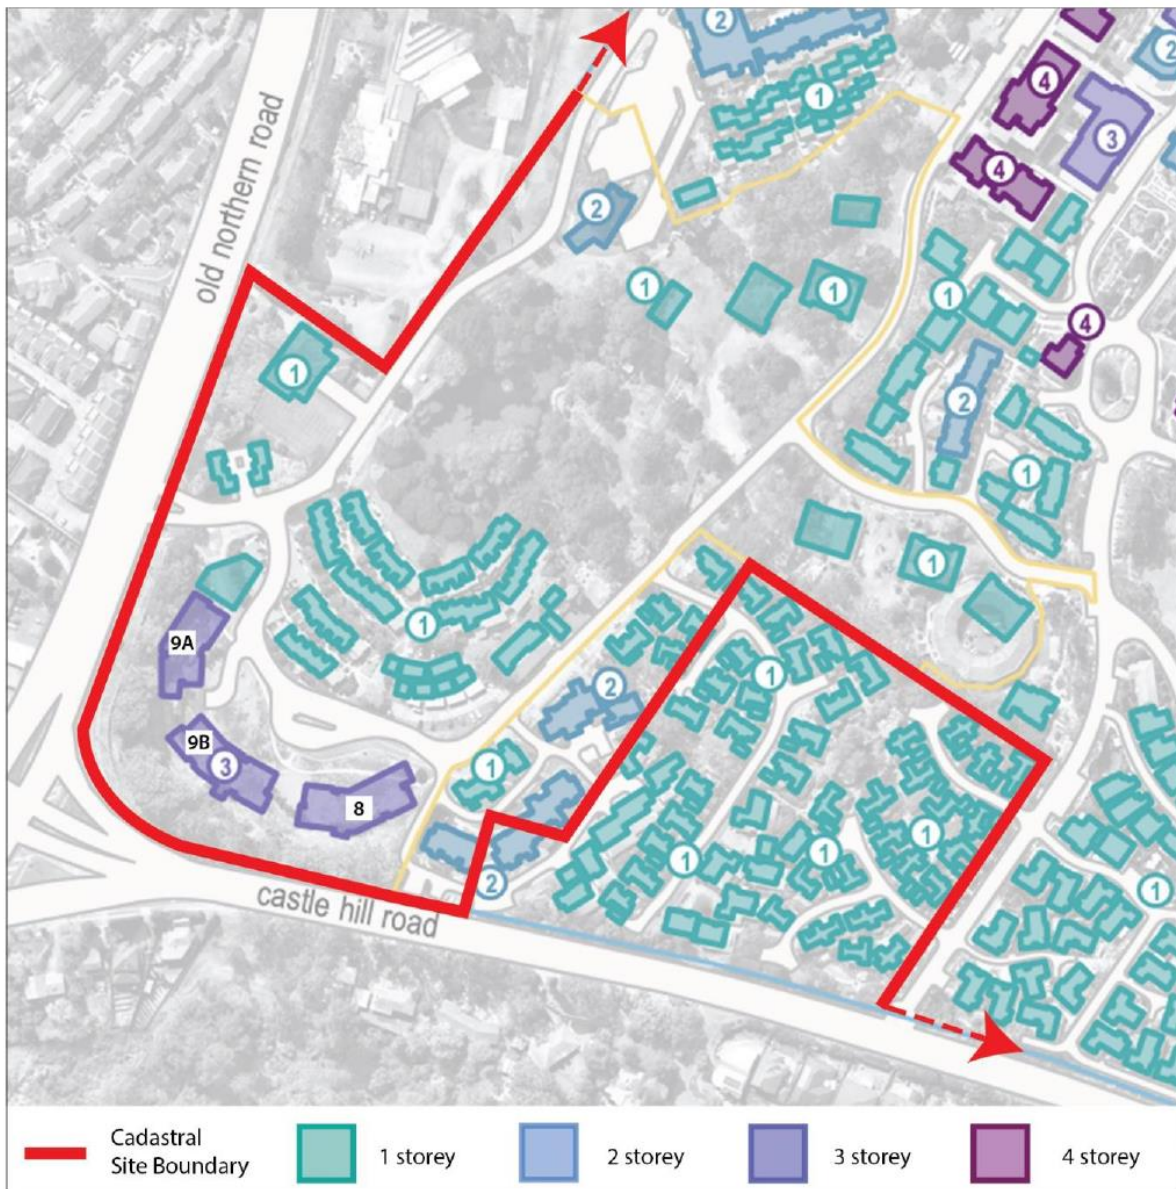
"Figure 1" extract from Clause 4.6 request showing offending buildings 8, 9A and 9B in purple at the bottom left of the image. Site boundary is shown in red. Buildings are setback at 17m or greater to the site boundaries.
